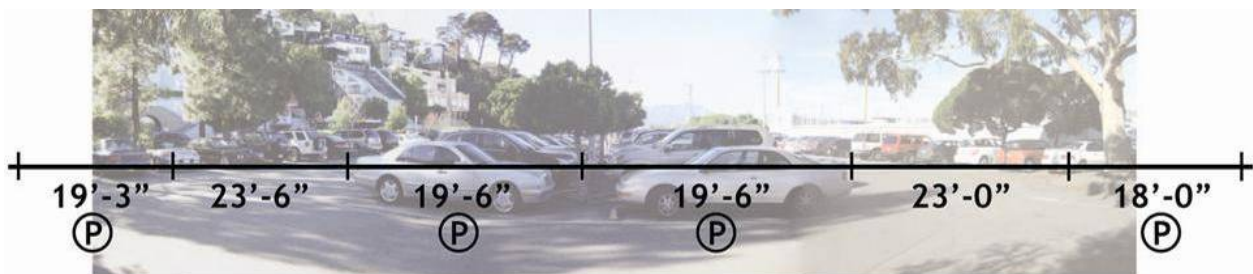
Segment 1D Parking Lot 3 South Existing Conditions
